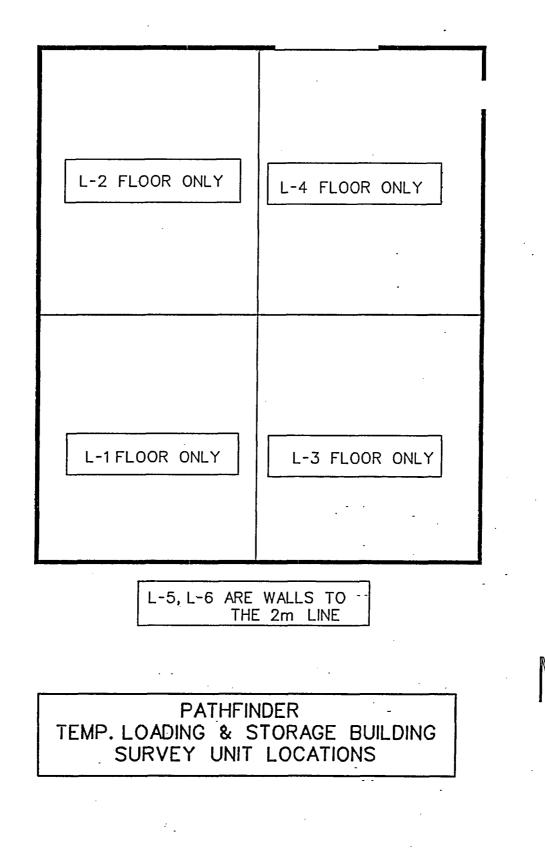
PATHFINDER TEMP, LOADING & STORAGE BUILDING SURVEY UNIT LOCATIONS
